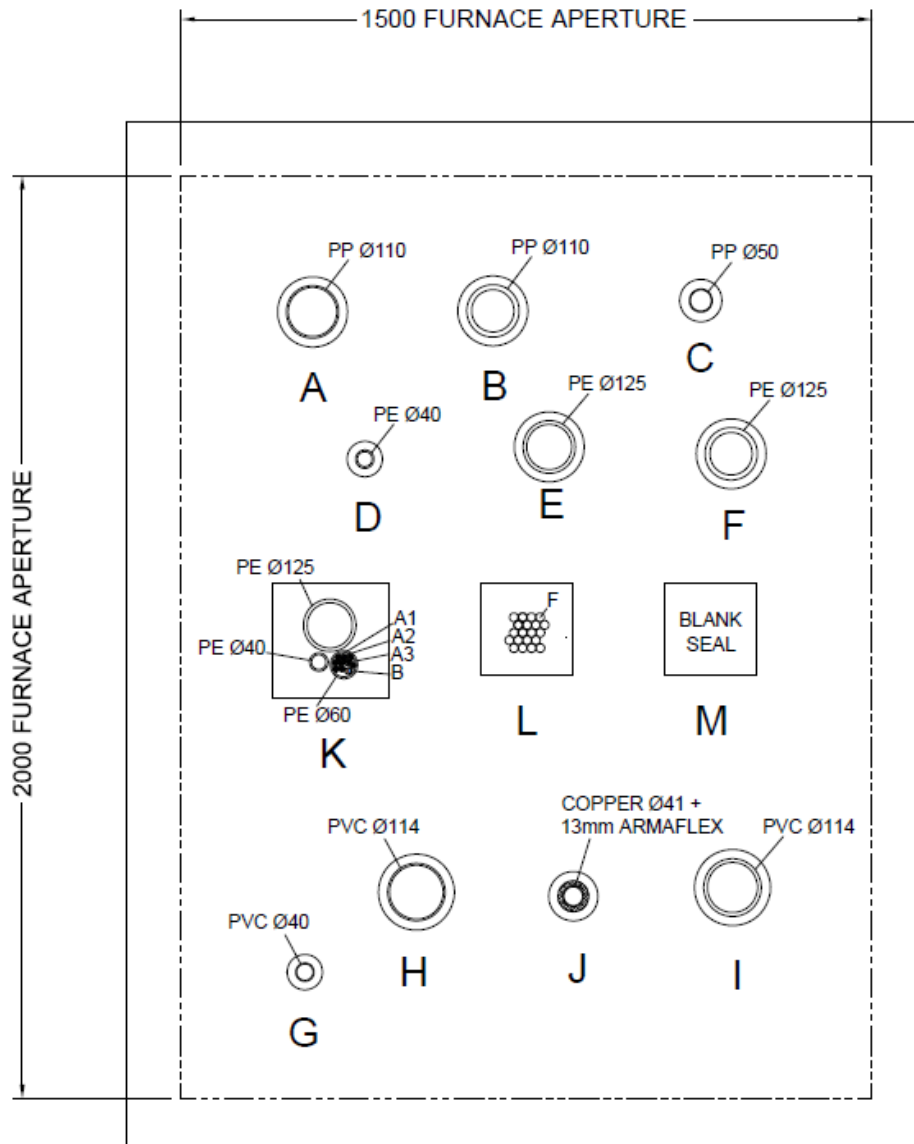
Plan of the unexposed face showing the aperture positions in a concrete floor
